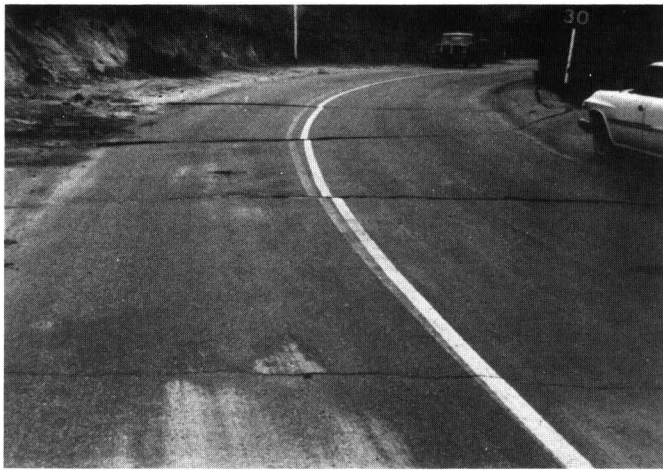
Highway cracks and offsets. Rocks in face of road cut shattered with explosive intensity.
